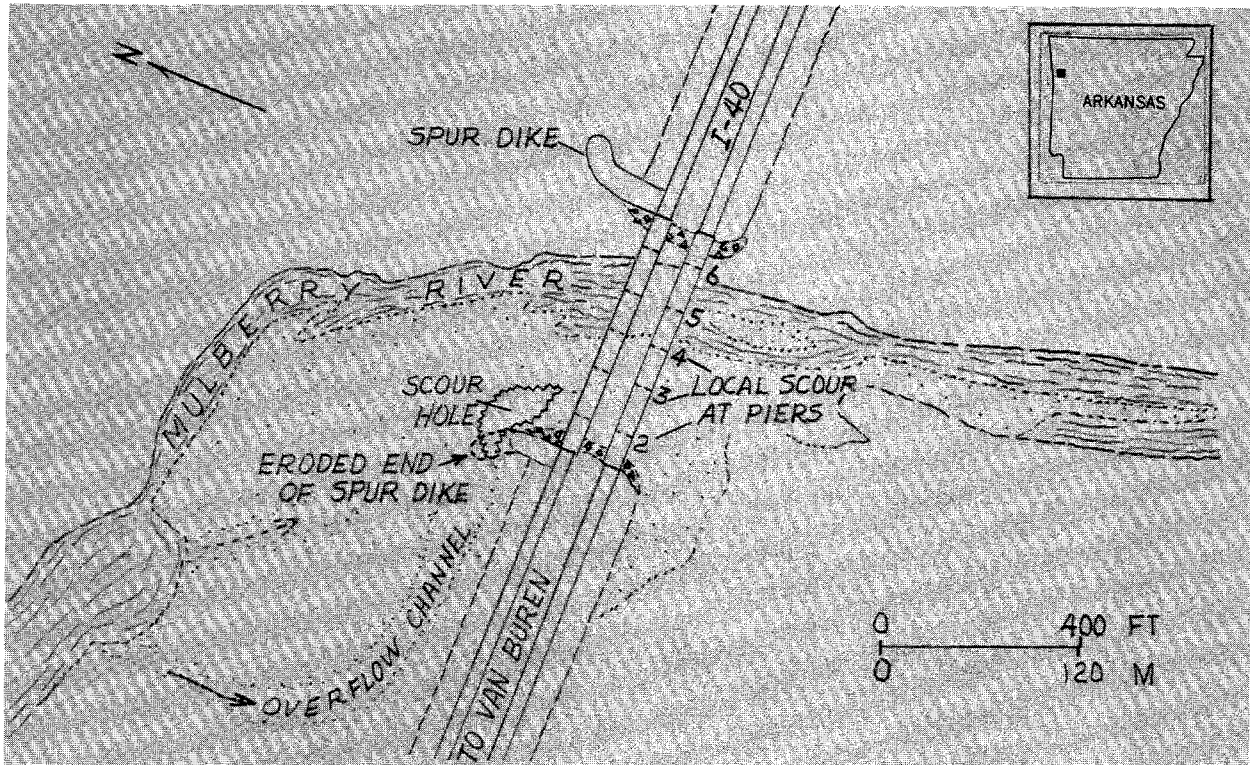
Plan sketch of I-40 crossing, Mulberry River, from aerial photograph taken in 1975.
